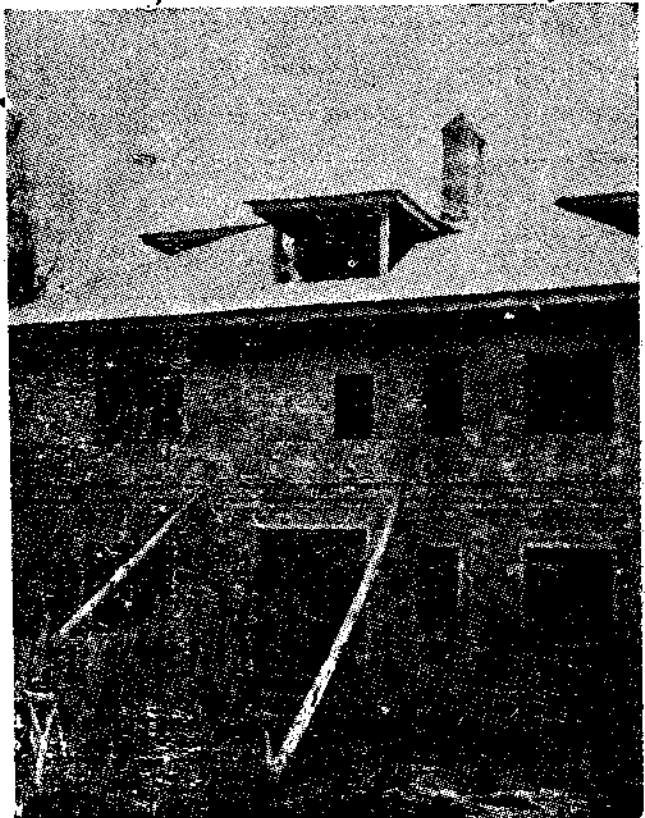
Damage of a New Brick Masonry Building in Mir Maidan.
